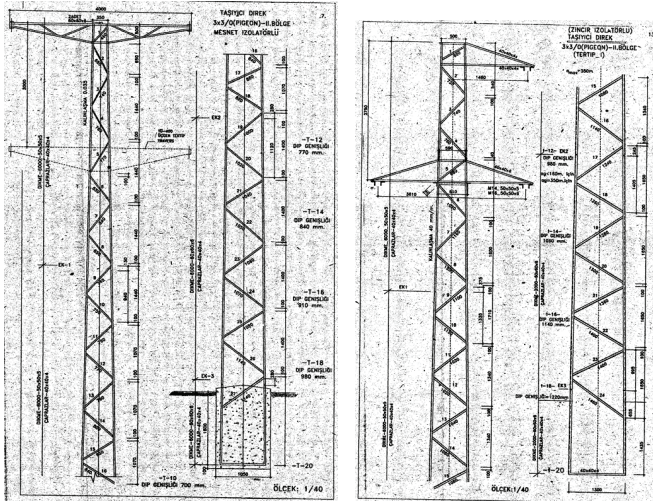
Technical Drawings of 3 AWG air line Z and N Poles
